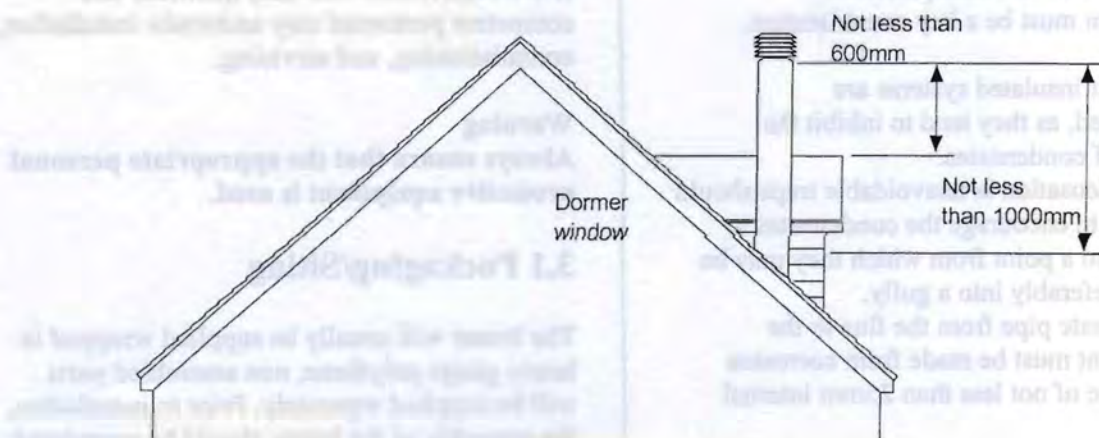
Pitched roof chimney within 1.5m from Dormer window
